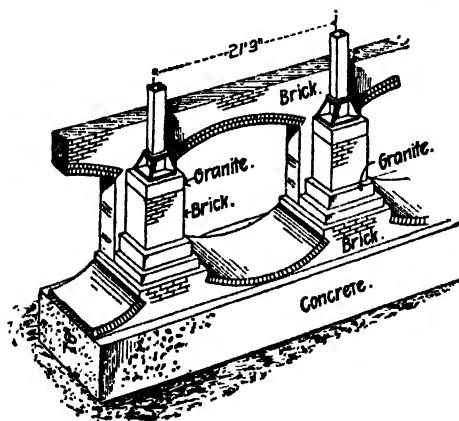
Footing of Inverted Masonry Arch, Drexel Building, Philadelphia, Pa.
